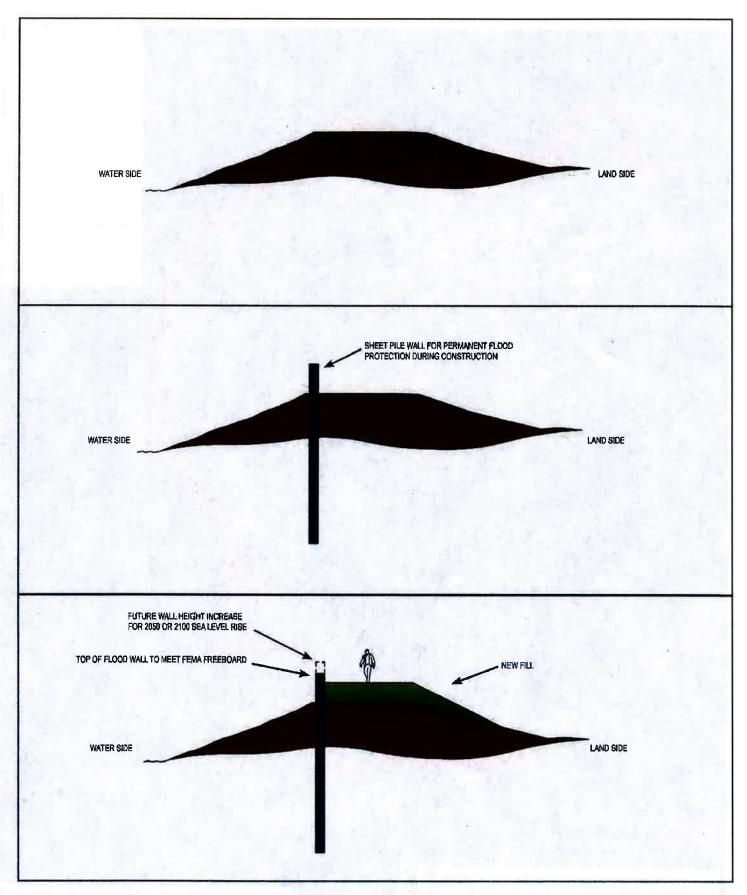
Typical Sheet Pile Flood Wall Cross Section Levee Protection Planning and Improvement Project CIP 301-657 City of Foster City, San Mateo County, California
